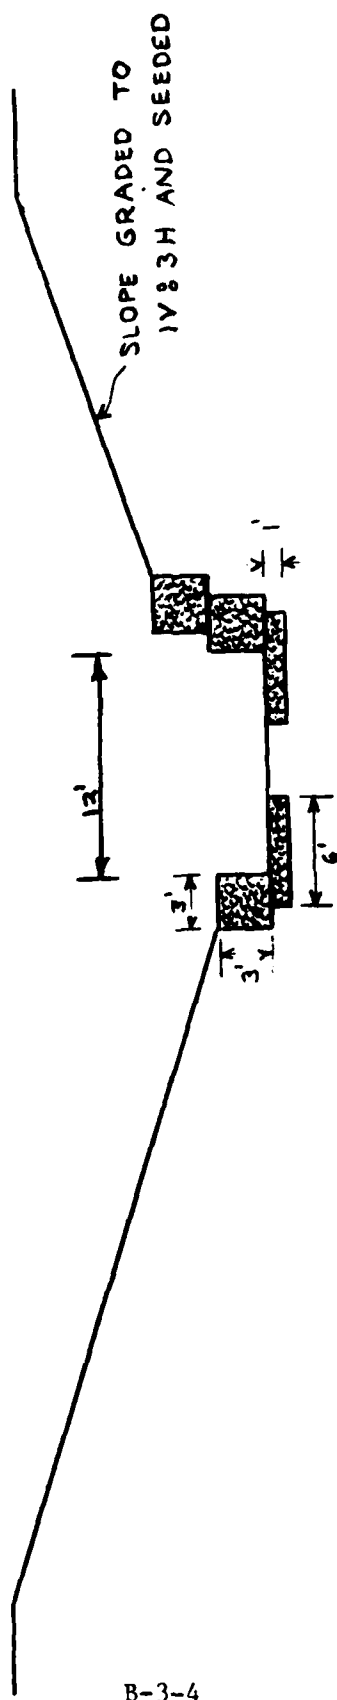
Typical cross section of Antelope Creek and Dead Man's Run, Lincoln, Nebraska
